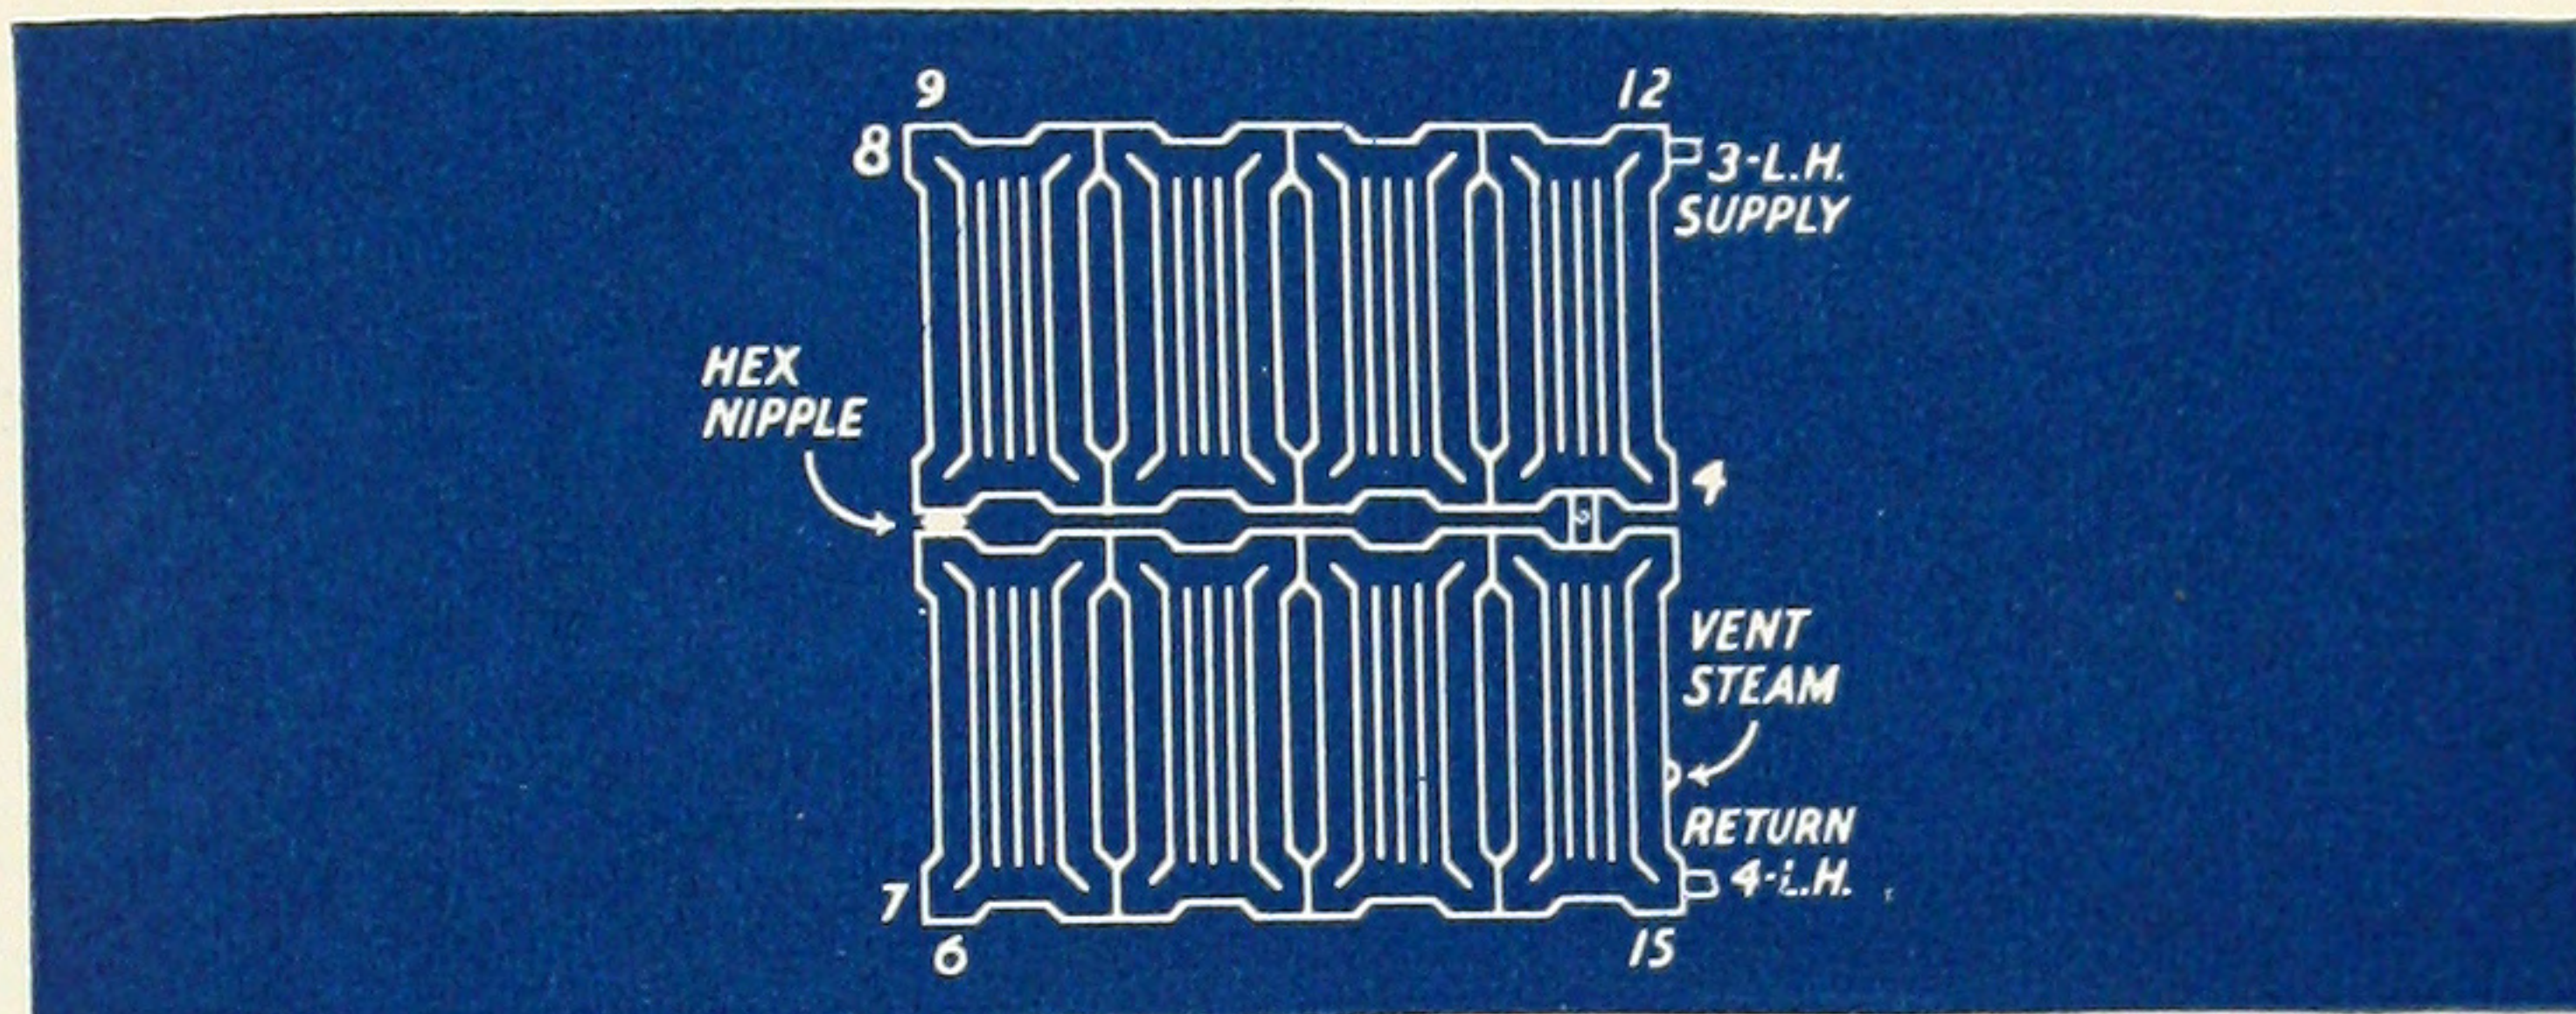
Assembled in eight sections in two tiers. For two pipe steam using adjustable spacing saddle.
